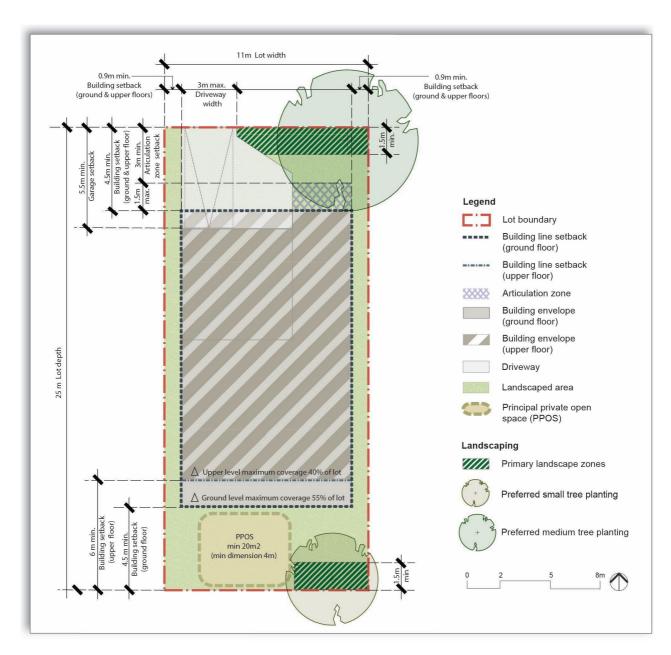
Typical lot layout on lots ≥9m but ≤12.5m
